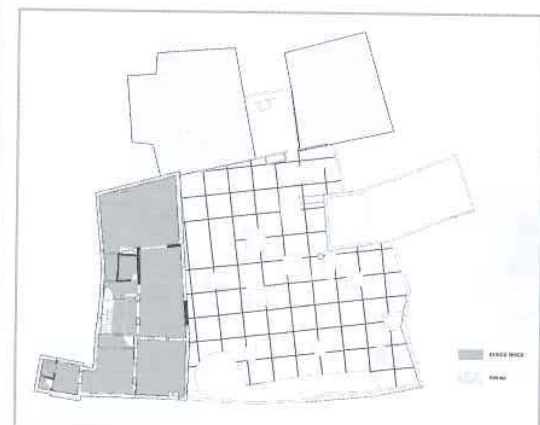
Ground floor plan (Fischfisch/Daoud).
